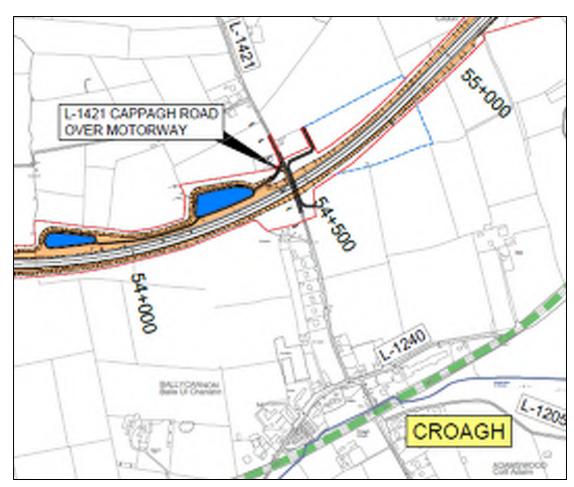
Bridge Proposed on Local Road L-1421 at Croagh (as per November 2018 Design Update)
